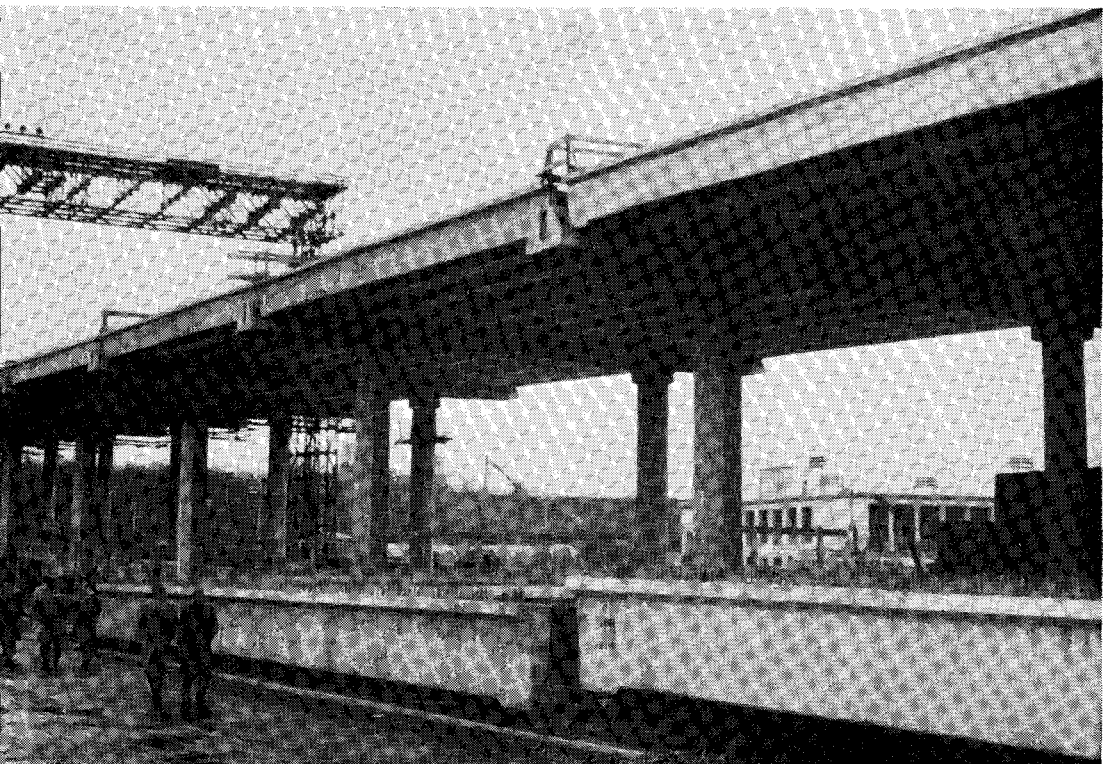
Approach to the Moscow River Bridge, using precast post-tensioned girders of 72-ft. spans.
